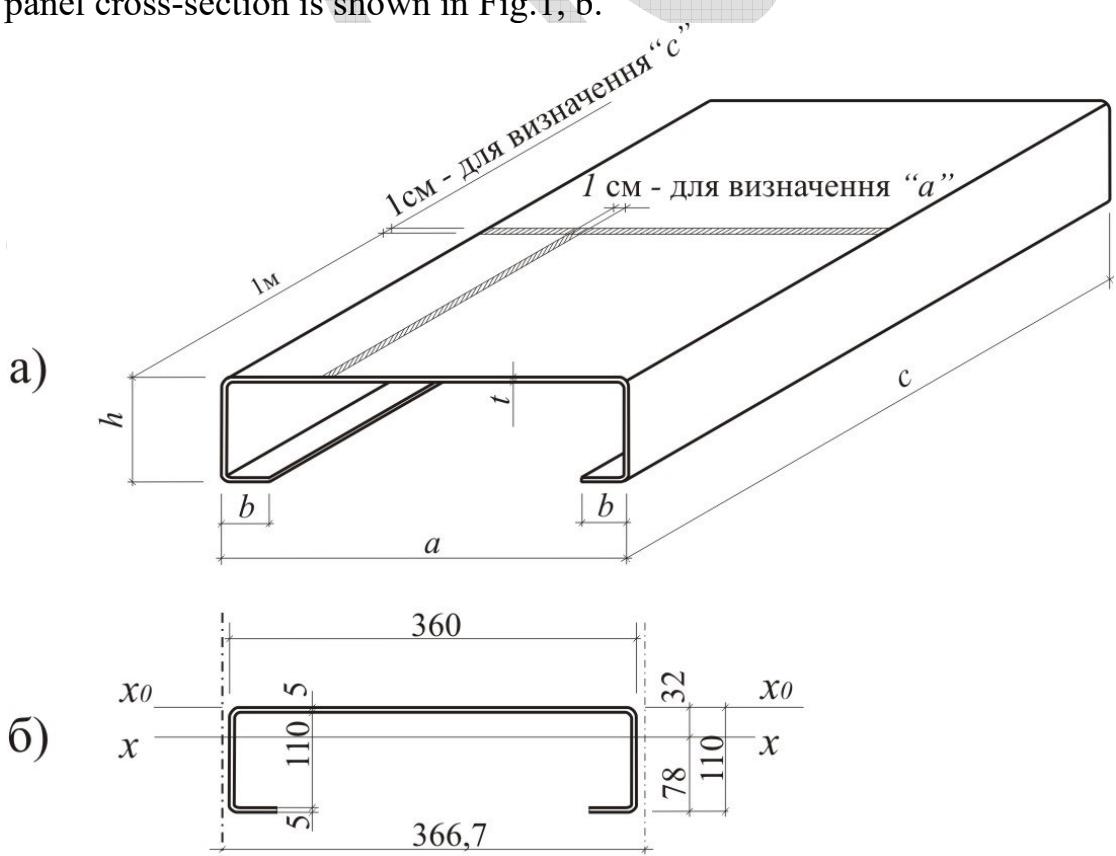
Panel flooring: a - geometric dimensions; b - composite cross section
